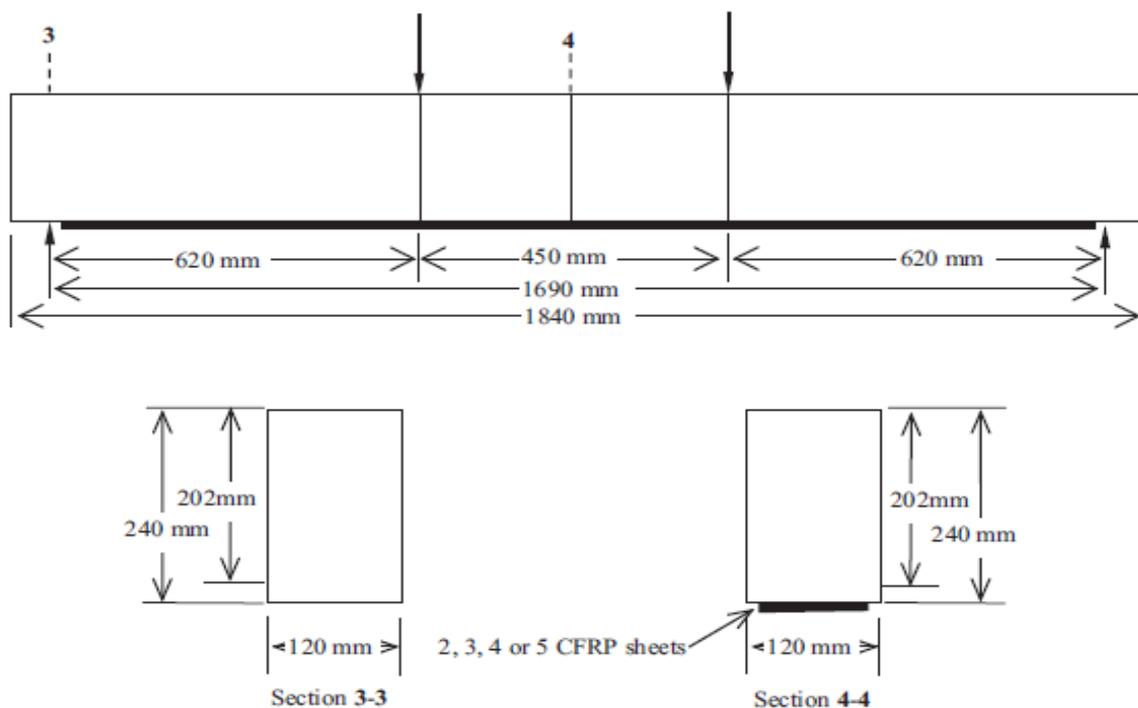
Details of concrete beams by CFRP. Hawileh et al. (2015).
